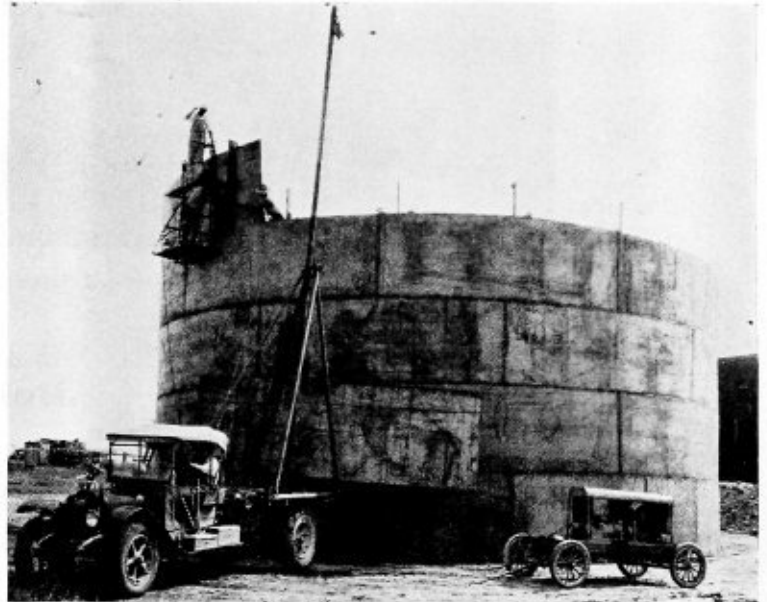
Storing tank of 80,000 barrels capacity, erected without bolts or rivets used at the seams
